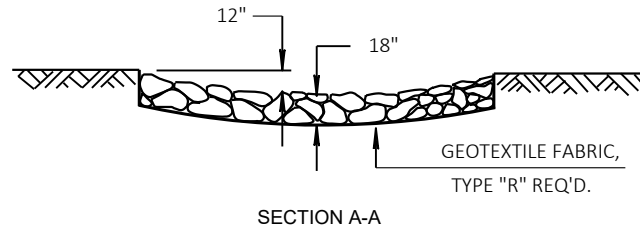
DETAIL FOR EXCAVATION BELOW SUBGRADE (SPRING AREA)
